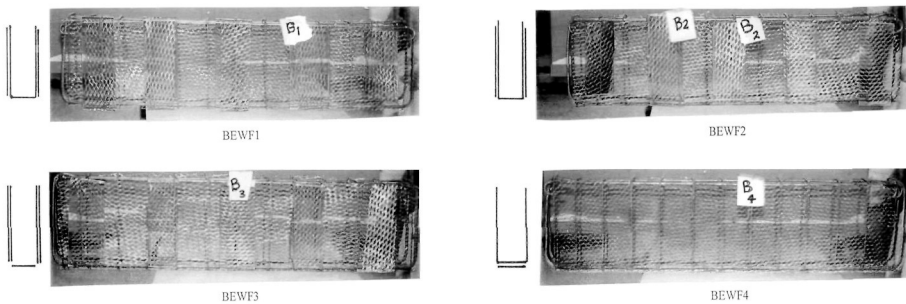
Photographs for using EWF as reinforcement and formwork for different beams.
